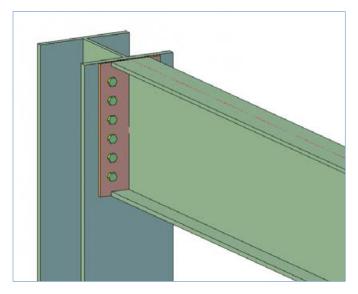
SINGLE SIDE END PLATE JOINT WITH SIX VERTICAL BOLTS IN GROUP 1 AND CENTER BOLT LAYOUT
